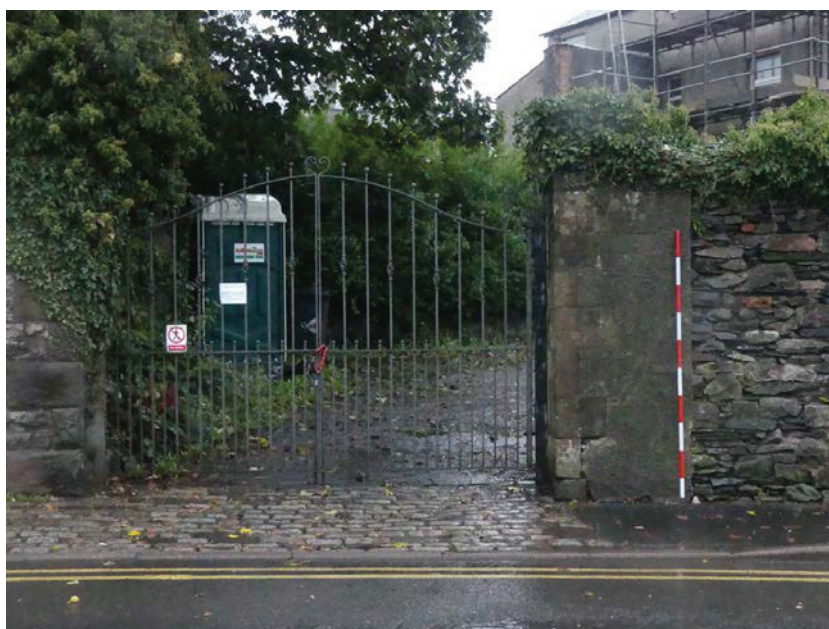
The gateway in the boundary wall extending the north-west end of the south-west elevation
